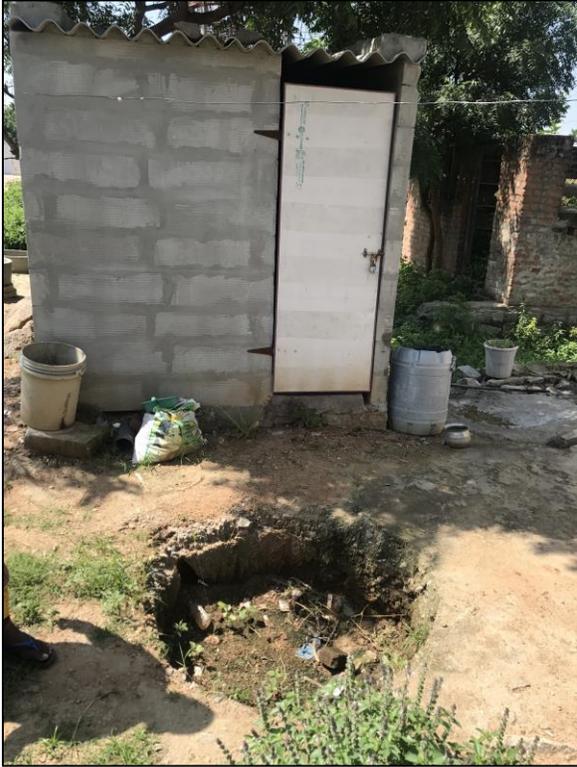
Picture of a toilet with a fully constructed superstructure without a substructure as hard, rocky area was encountered *Credit: Author's own
